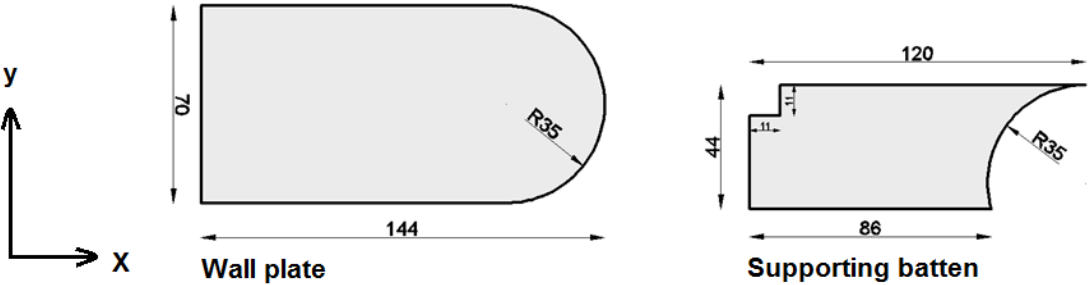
; Section plane of the rotated wall plate and supporting batten
